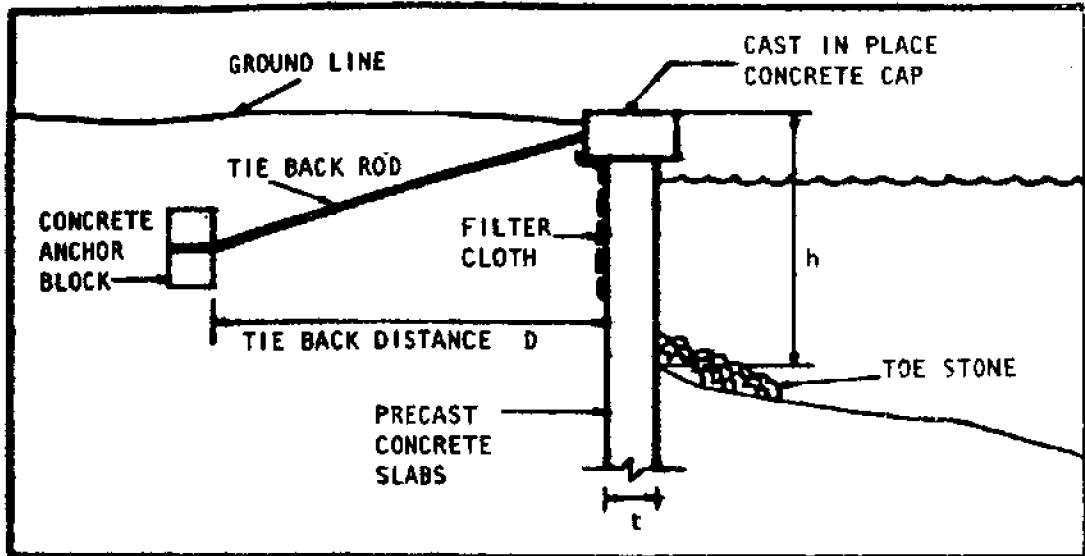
Typical dimensions of precast concrete seawalls for protected waters
